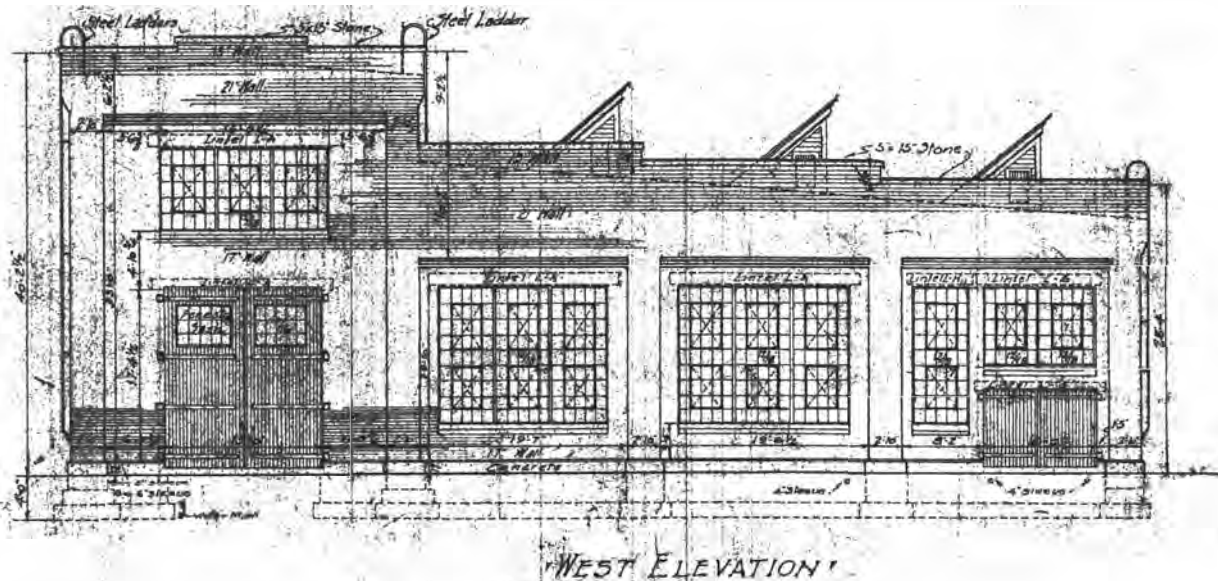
Machine Shop west elevation, Union Pacific Railroad, 1918.
